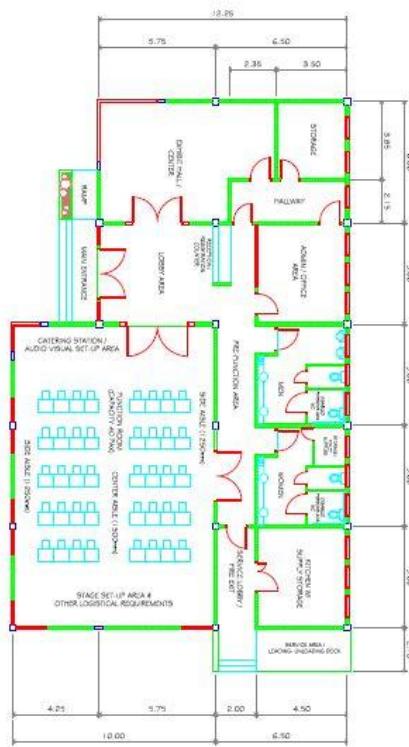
Floor plan of proposed education center in KIEBC ©KFI
